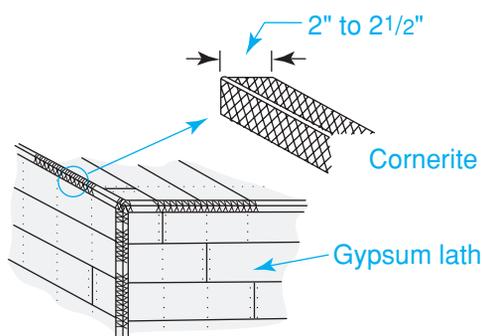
Cornerite Reinforcer Cornerite is installed at inside corners for reinforcement and to limit plaster cracks.
